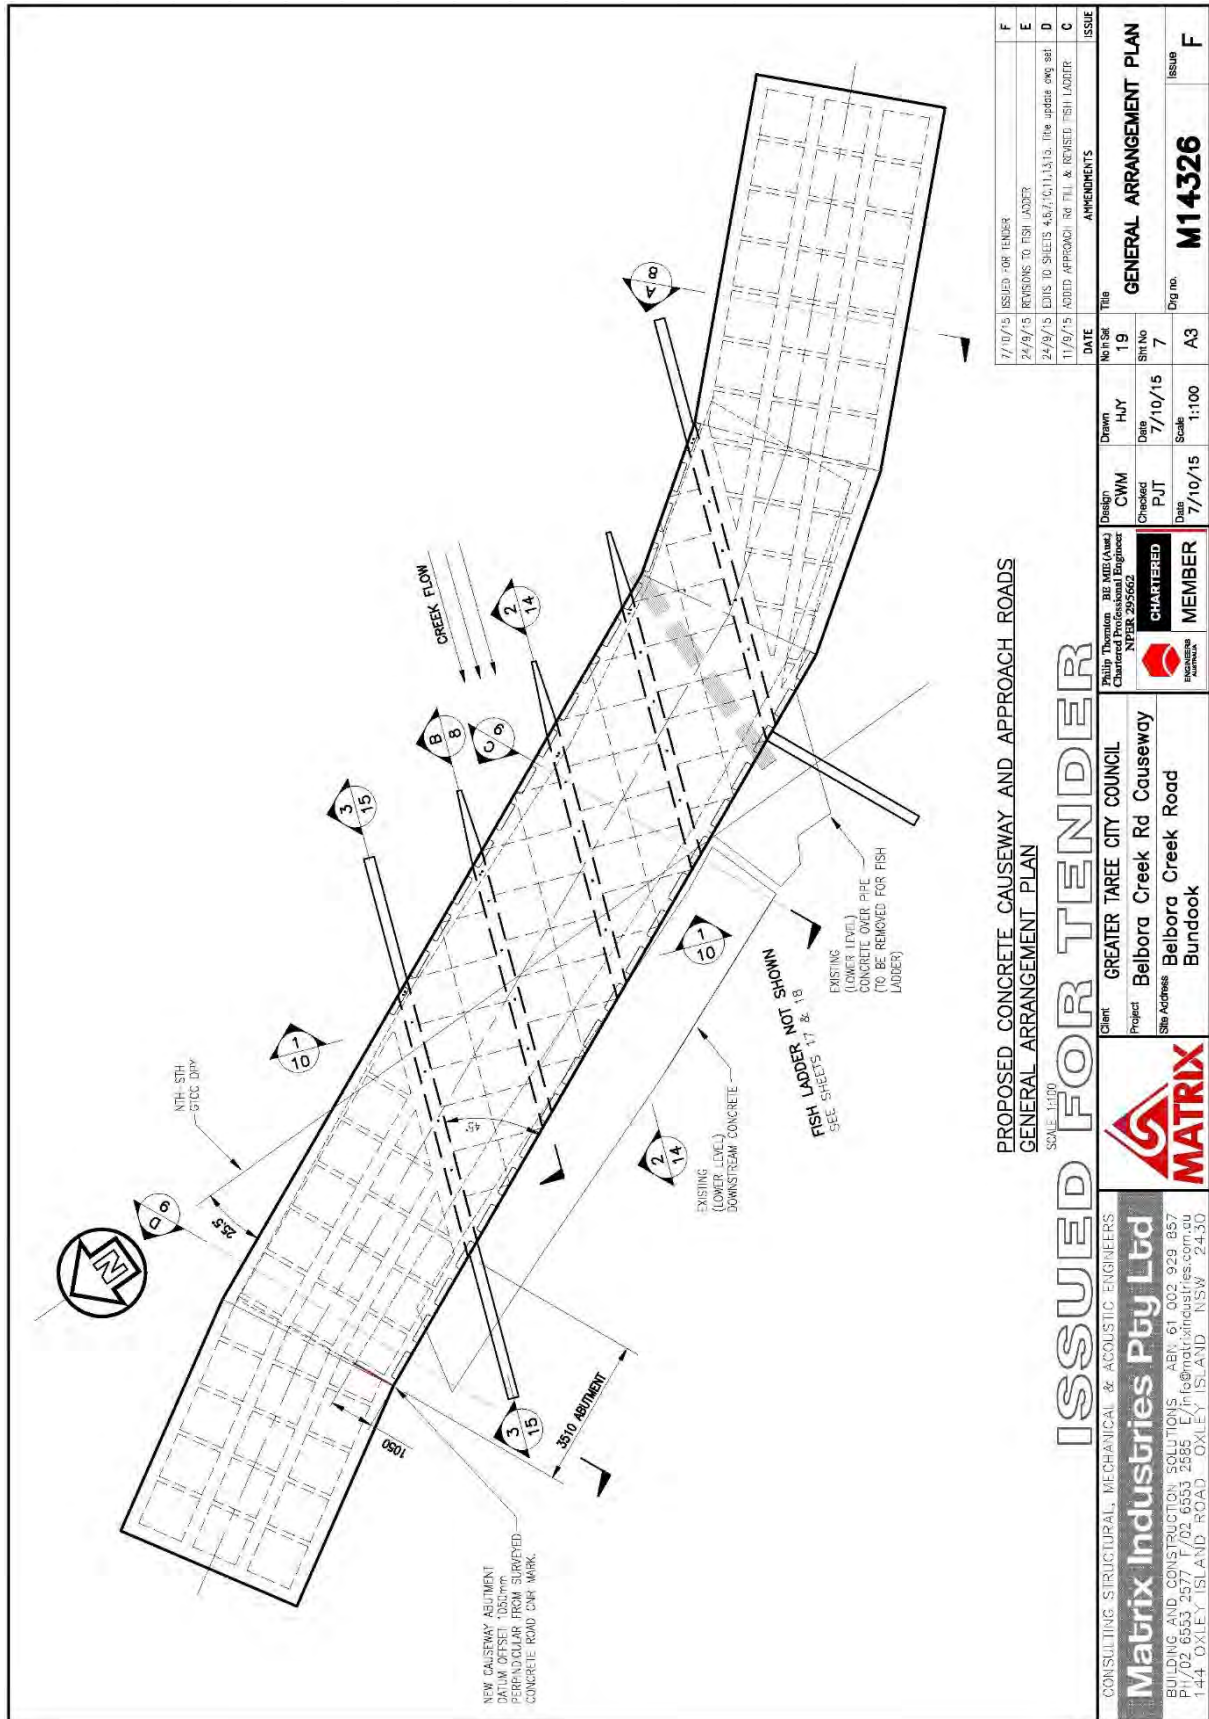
General arrangement of Waffle pods and concrete beams on the causeway and approach road slabs.
